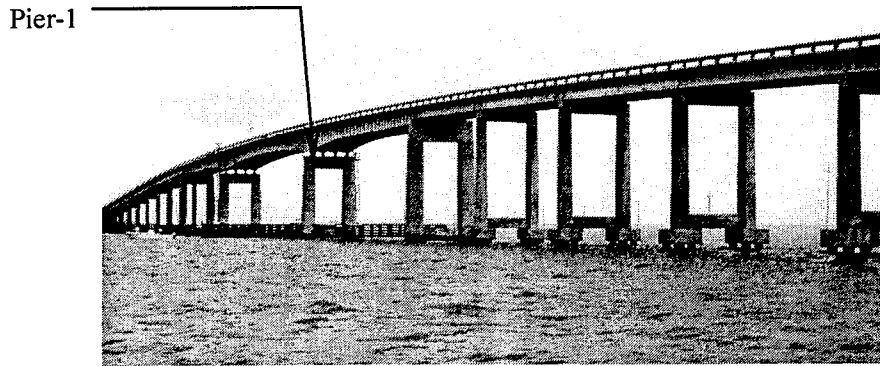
Pier-1 in relation to entire bridge structure (view looking north)
